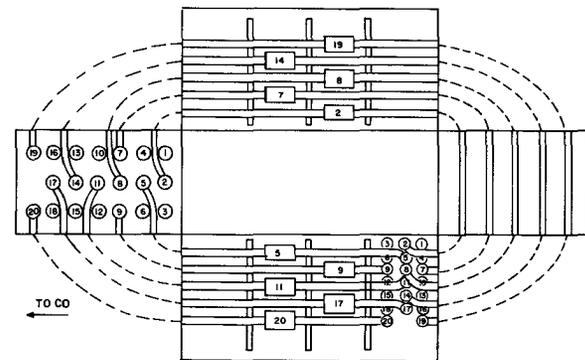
Type I Manhole—6-Foot Wide—20-Duct Capacity—4-Wide Configuration
